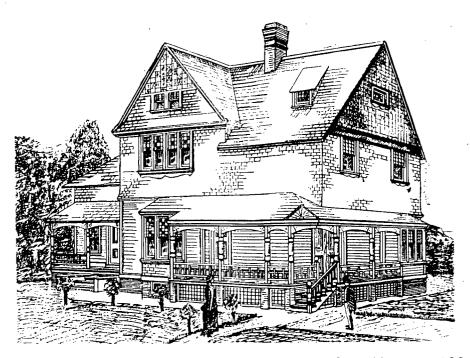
Robert Shoppell, Design 148 (Modern Low Cost Houses, 1884.
